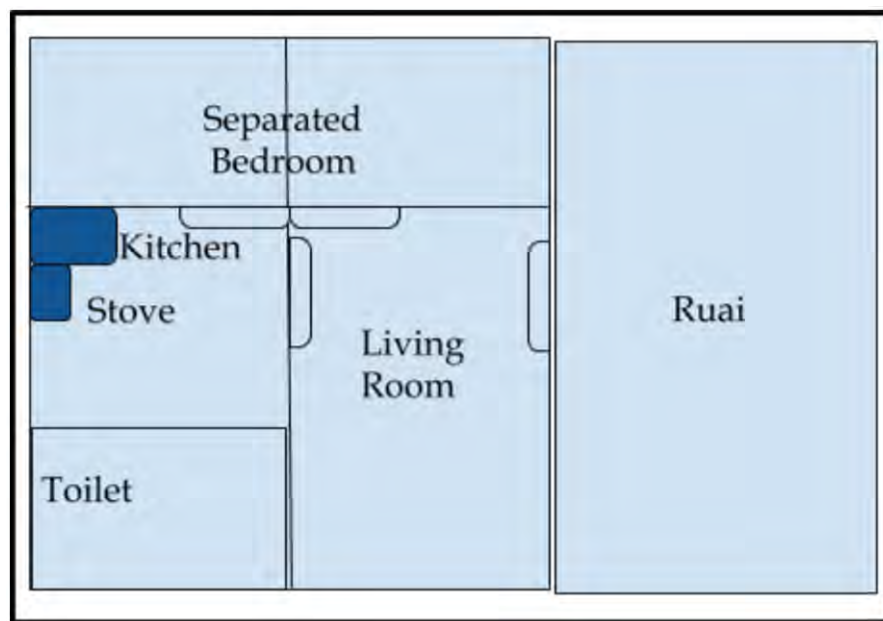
shows a floor plan of one bilik apartment of the current Rumah Panjang.
